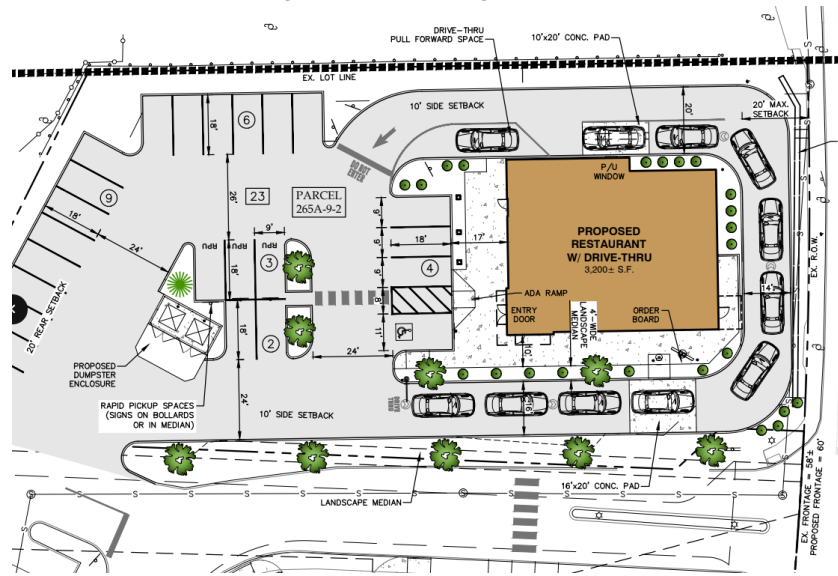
The conceptual site plan for 1220 Brighton Avenue
